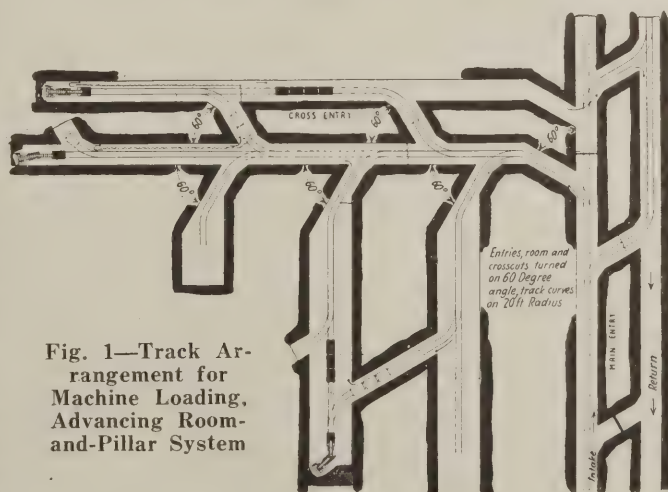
Track Arrangement for Machine Loading, Advancing Room-and-Pillar System
